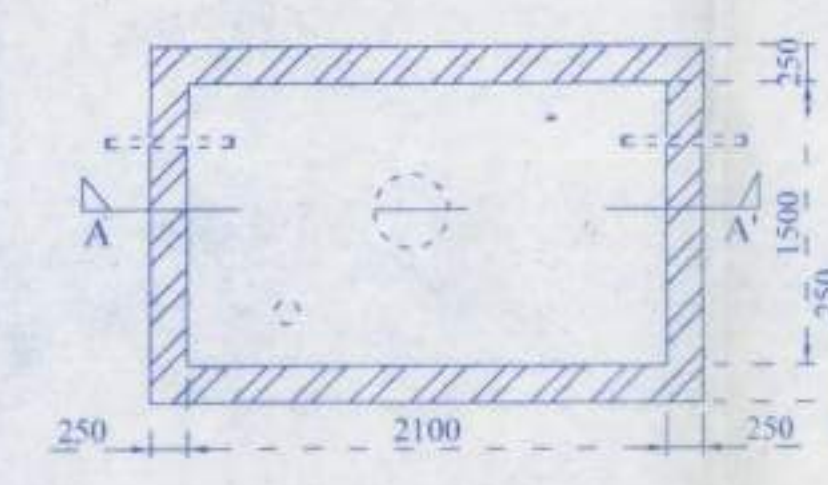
DETAILS OF SOAK PIT, SEPTIC TANK & INSPECTION CHAMBER NOT TO SCALE
